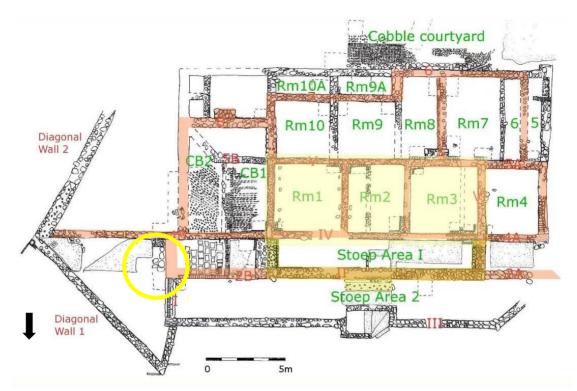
Expansion of the dwelling to the south of the earlier core. Diagonal Wall 2 appears to be part of the foundations of the outbuildings shown on Snow (1860).
